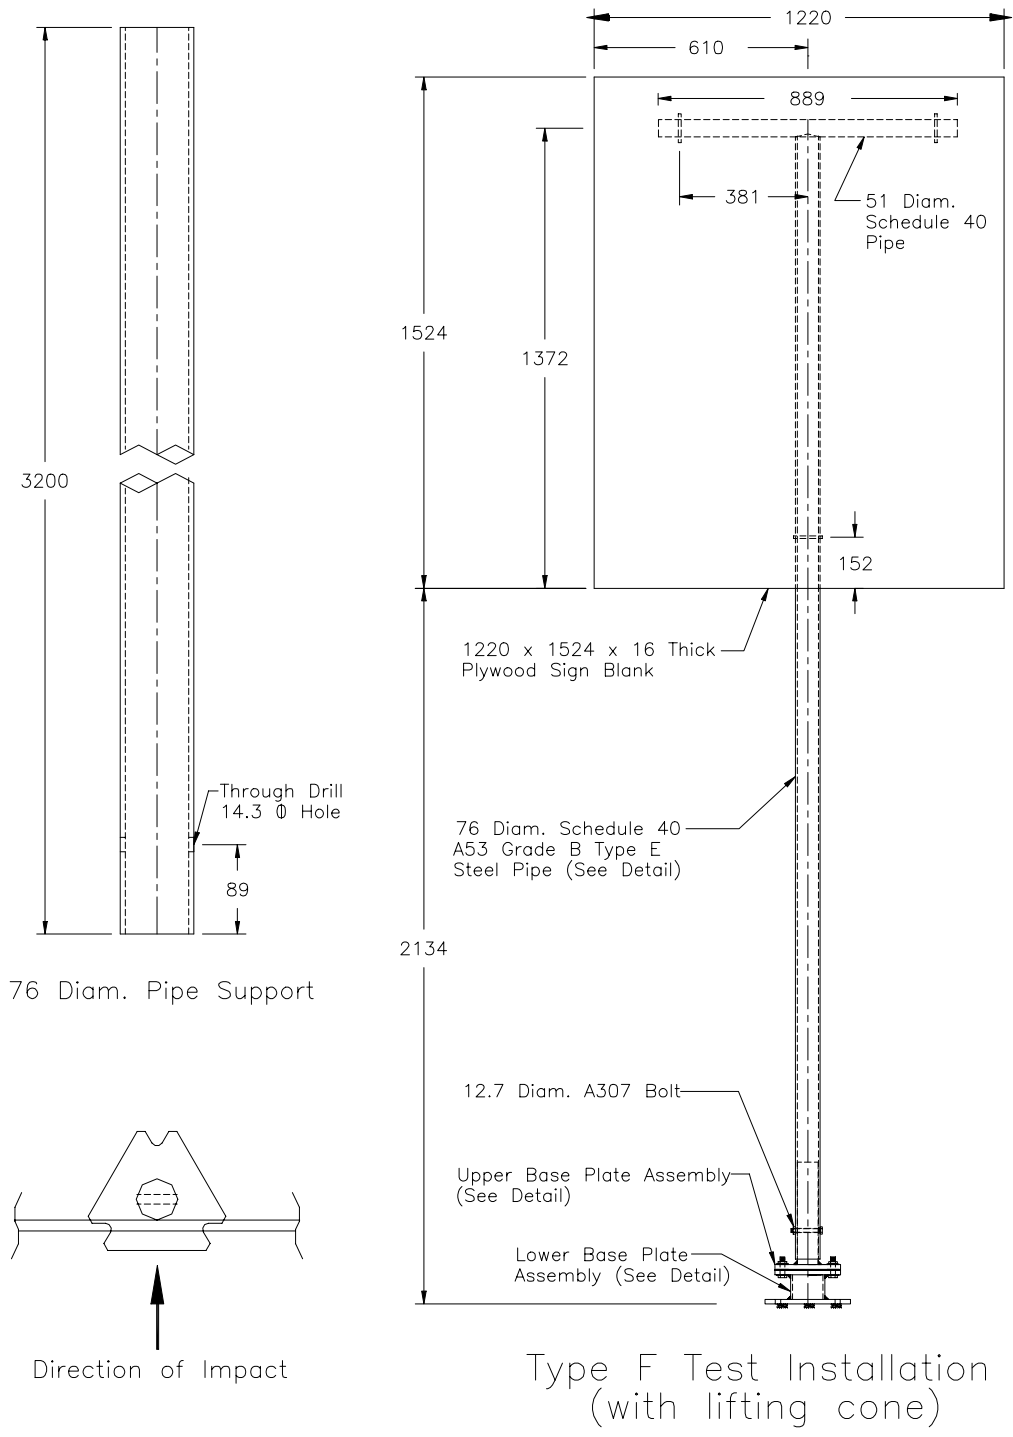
Details of Sign Support Installation Used for Evaluation of Lifting Cone.
